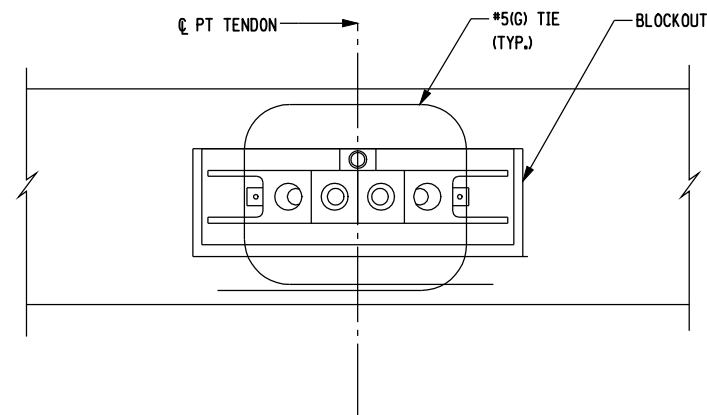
DETAIL B - PT STRAND ANCHORAGE PLAN AT SIDEWALK
